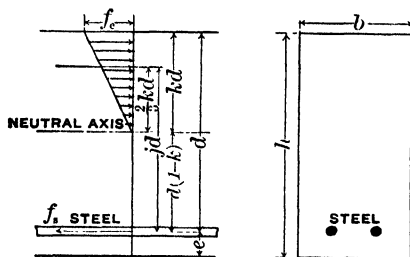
Resisting Forces in a Reinforced Concrete Beam. (See p. 352.)
